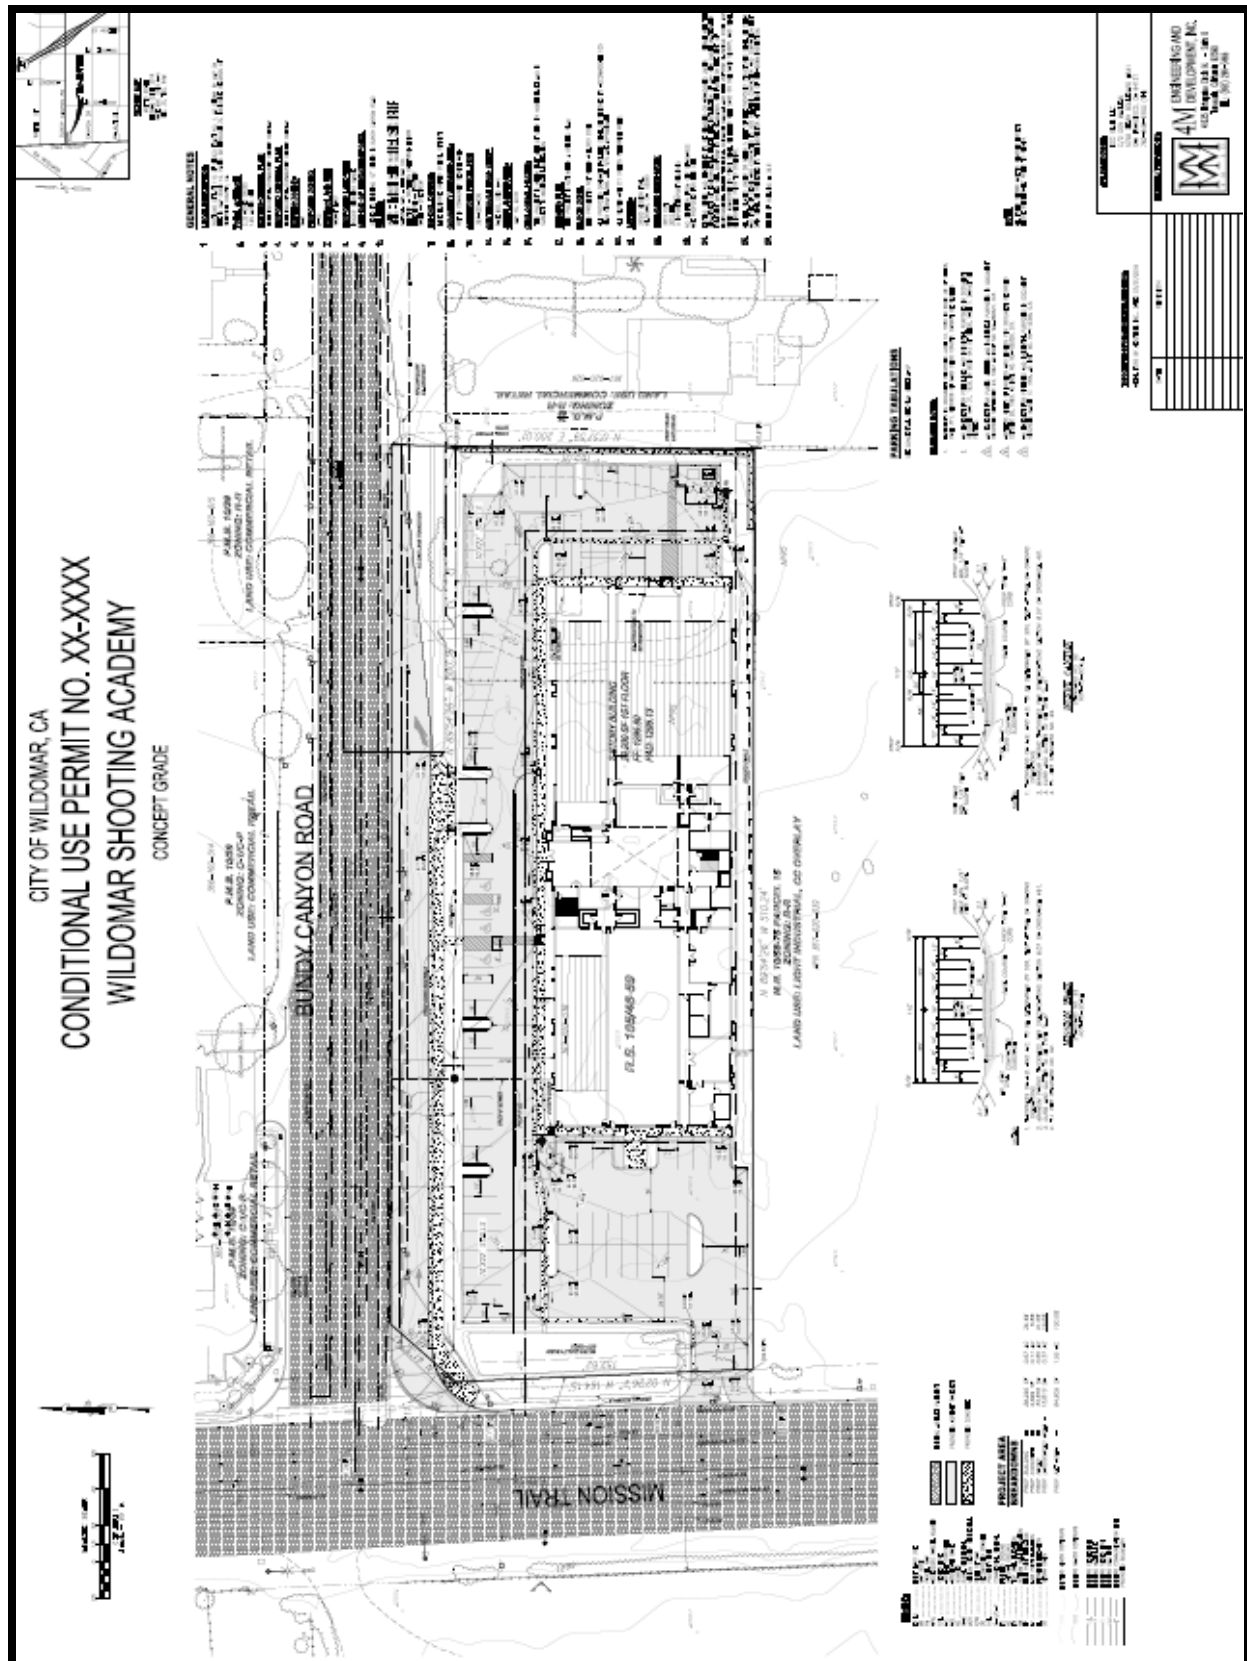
Proposed Wildomar Shooting Academy (APN 367-020-038).
